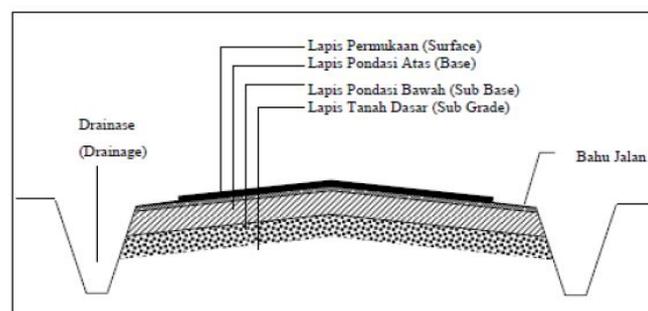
The Flexible Pavement Structural Components (silvia sukirman)
